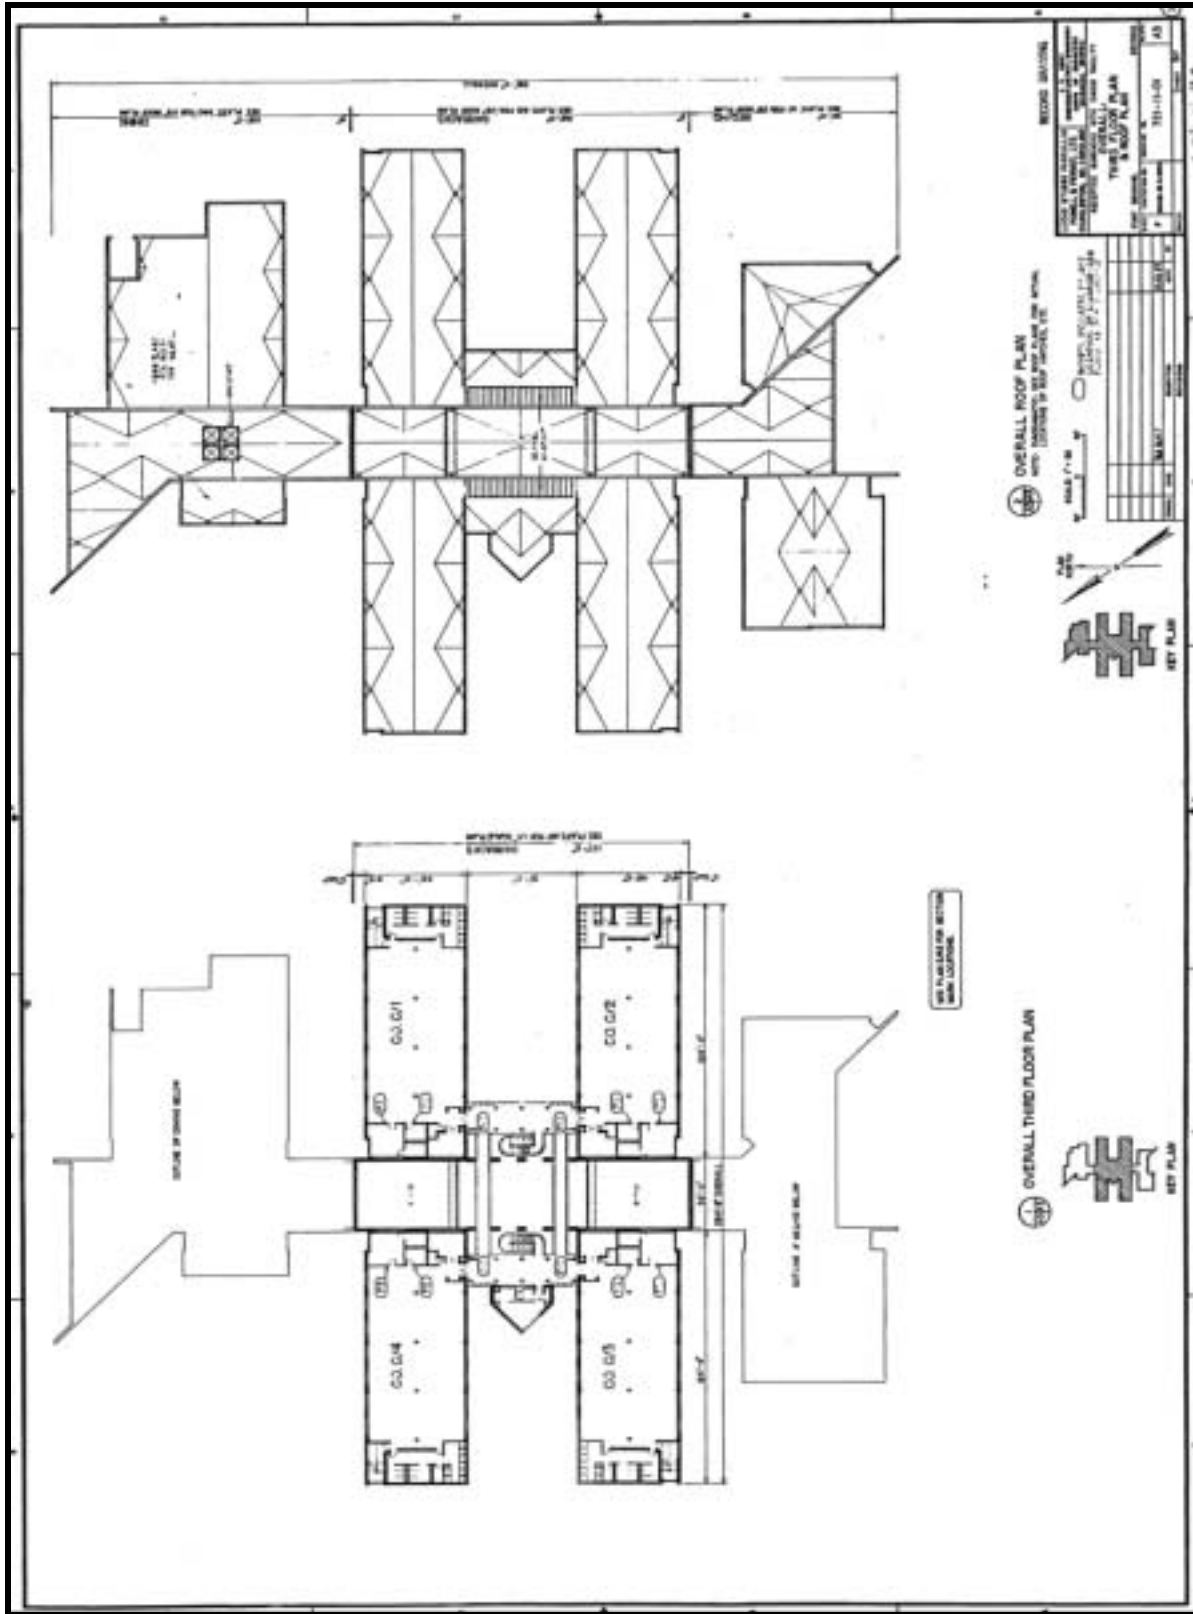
Receptee barracks, third floor and roof plan (1985, revised 1987) (Engineering, Ft. Benning).
